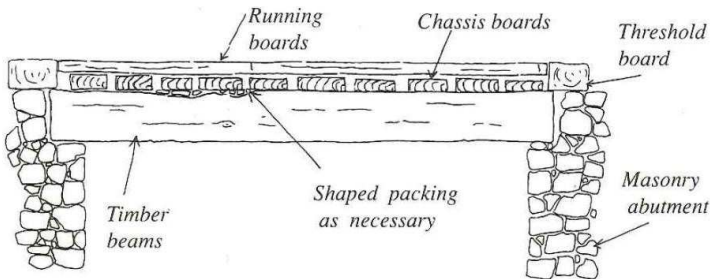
An example of a timber decked bridge structure (ILO, 1990).
